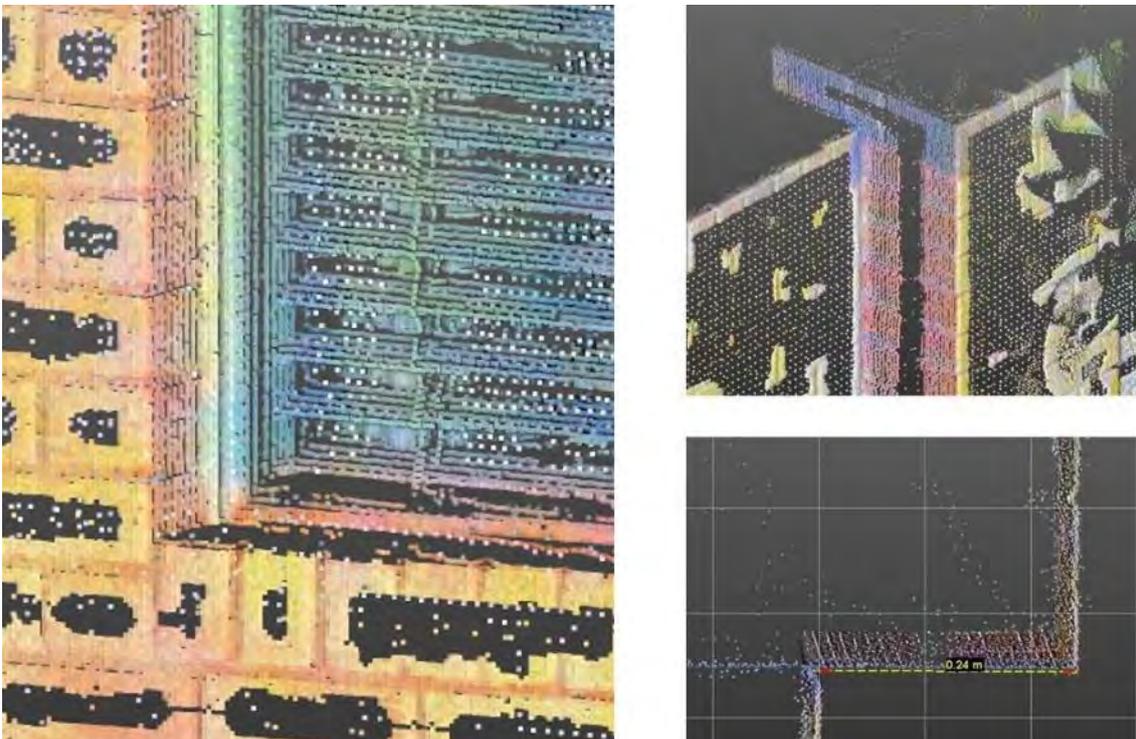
Scanned detail on window frame and edge of brick fencing pier (2023 scan).
